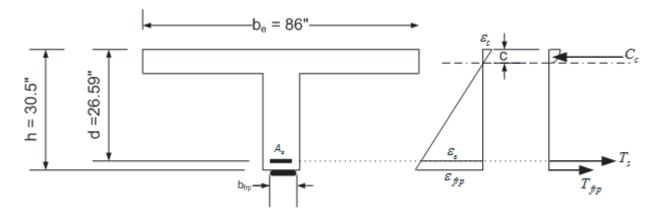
Reinforced concrete T-beam externally strengthened with FRP reinforcement
